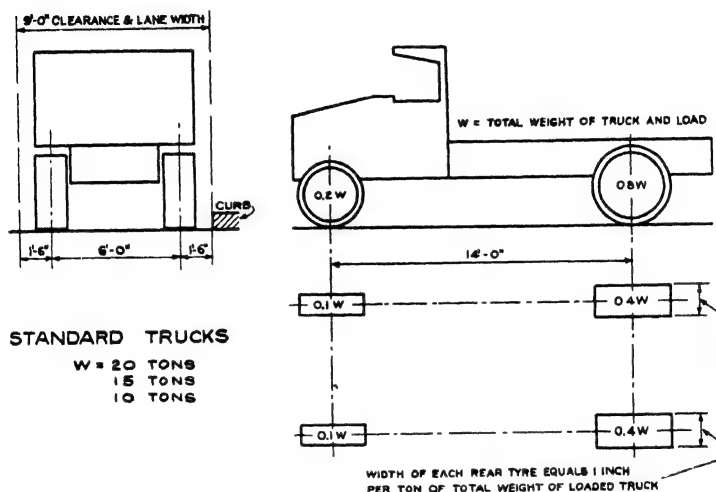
American Standard Trucks for Road Bridge Loading.
